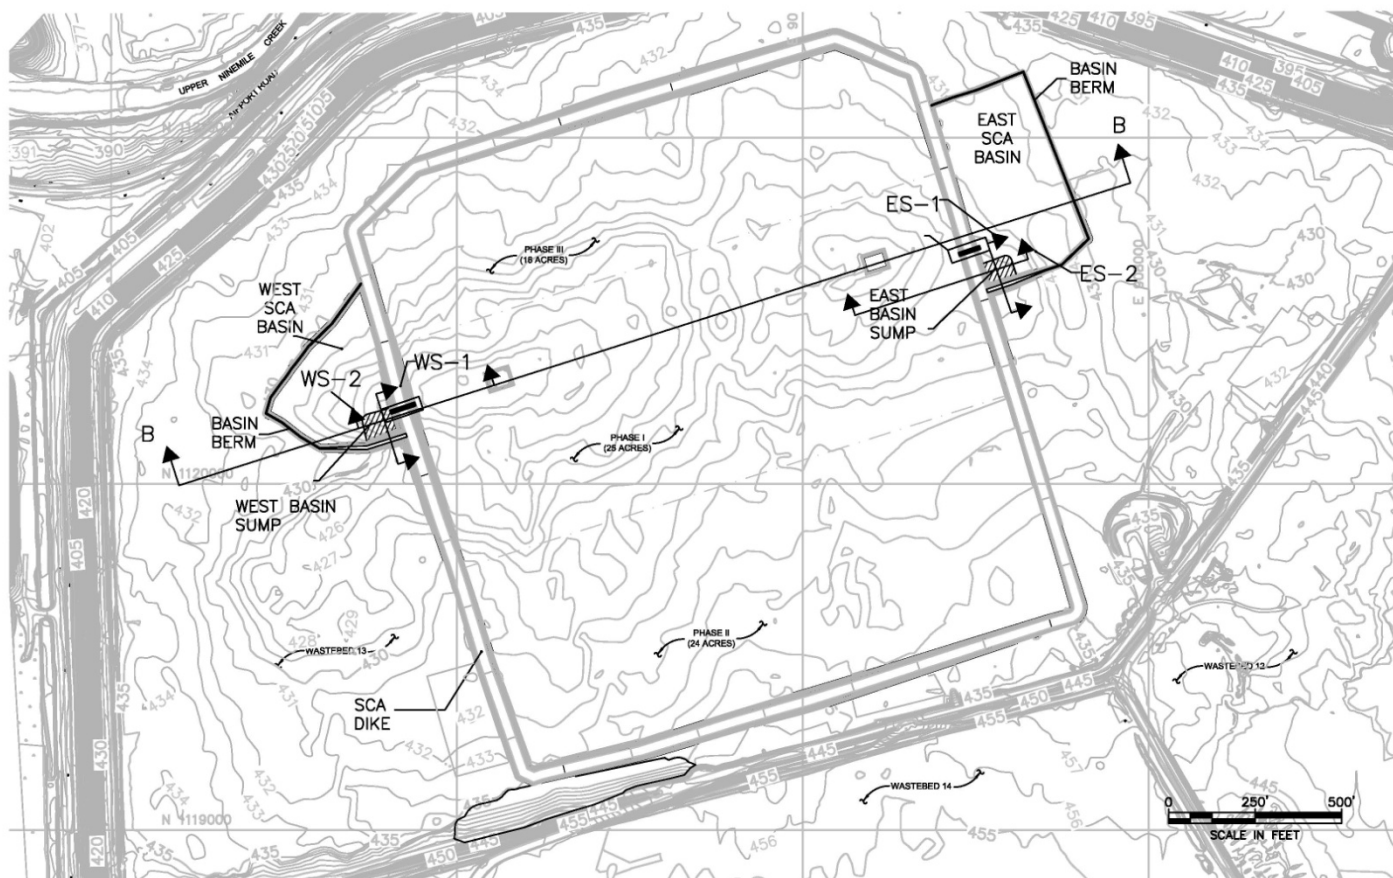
Plan View of SCA Site and Locations of Analyzed Cross Sections
